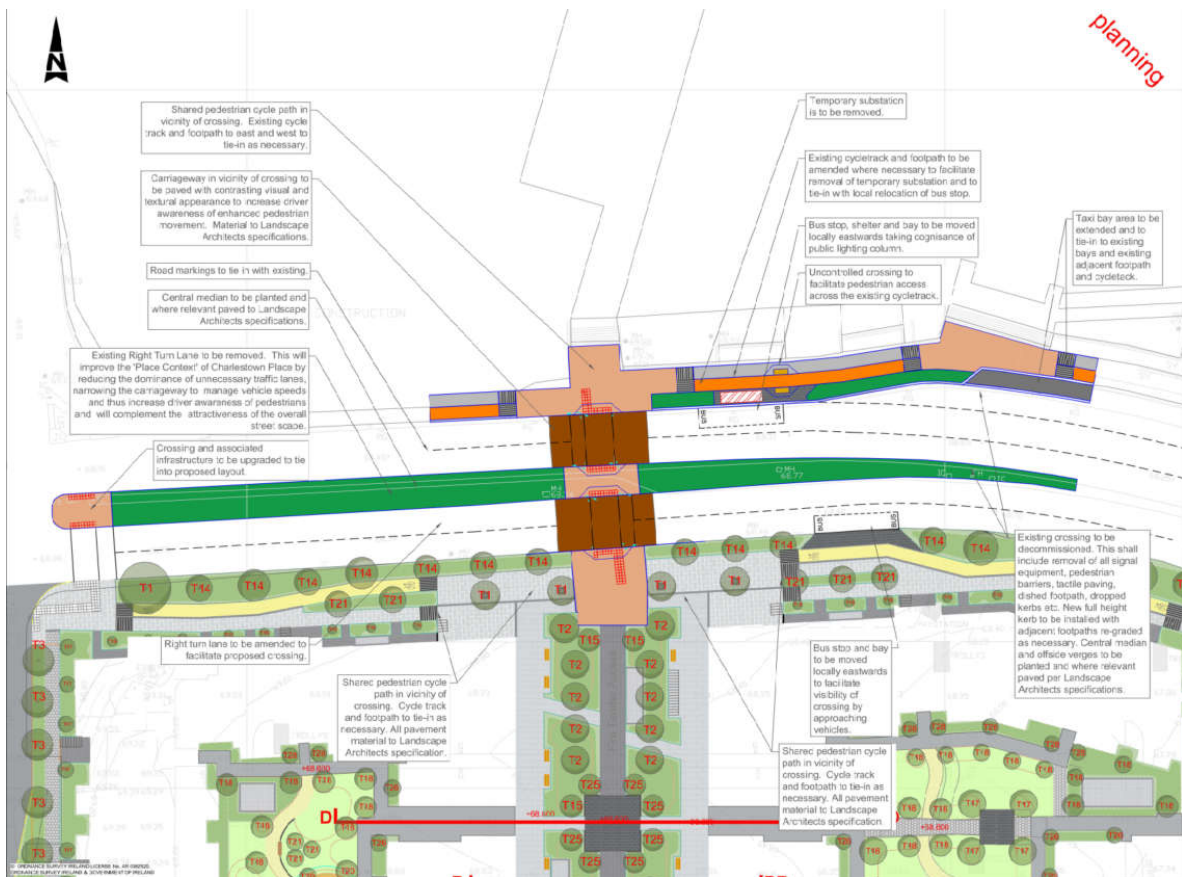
Charlestown Place Pedestrian Crossing Layout
